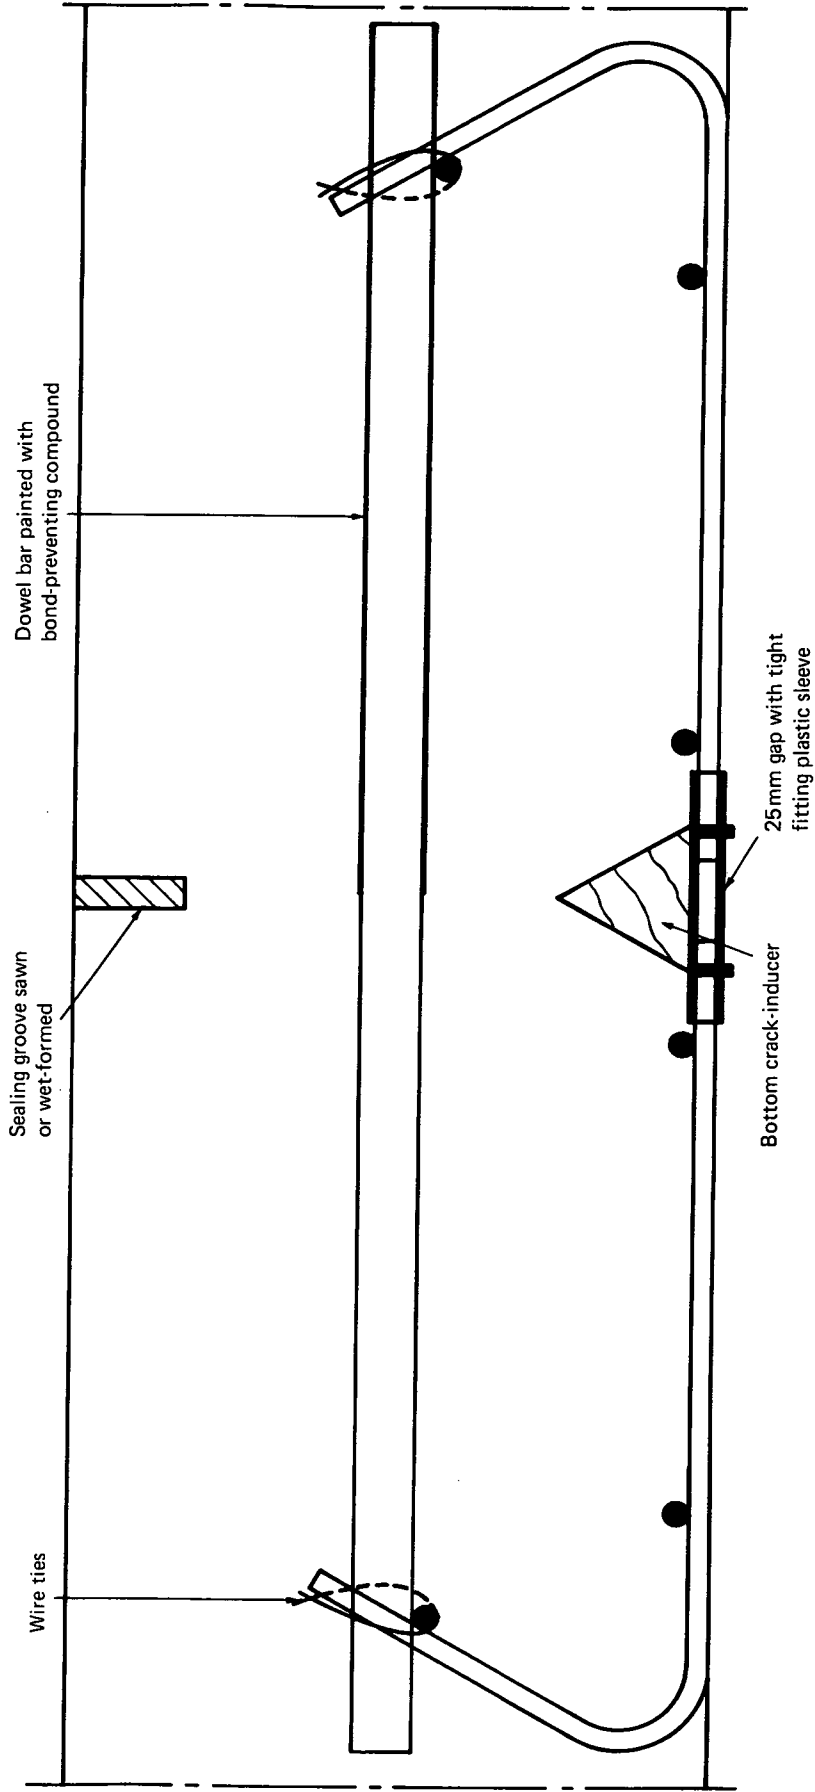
TYPICAL DETAIL OF CRADLE CONTRACTION JOINT ASSEMBLY
